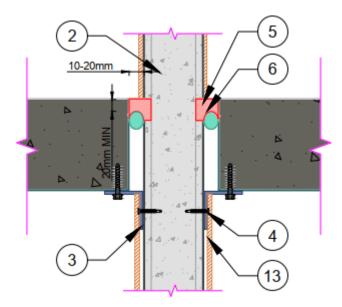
Dual wall system with vertical wall between horizontal walls – gap width of 10-20 mm between the stair and vertically oriented wall
